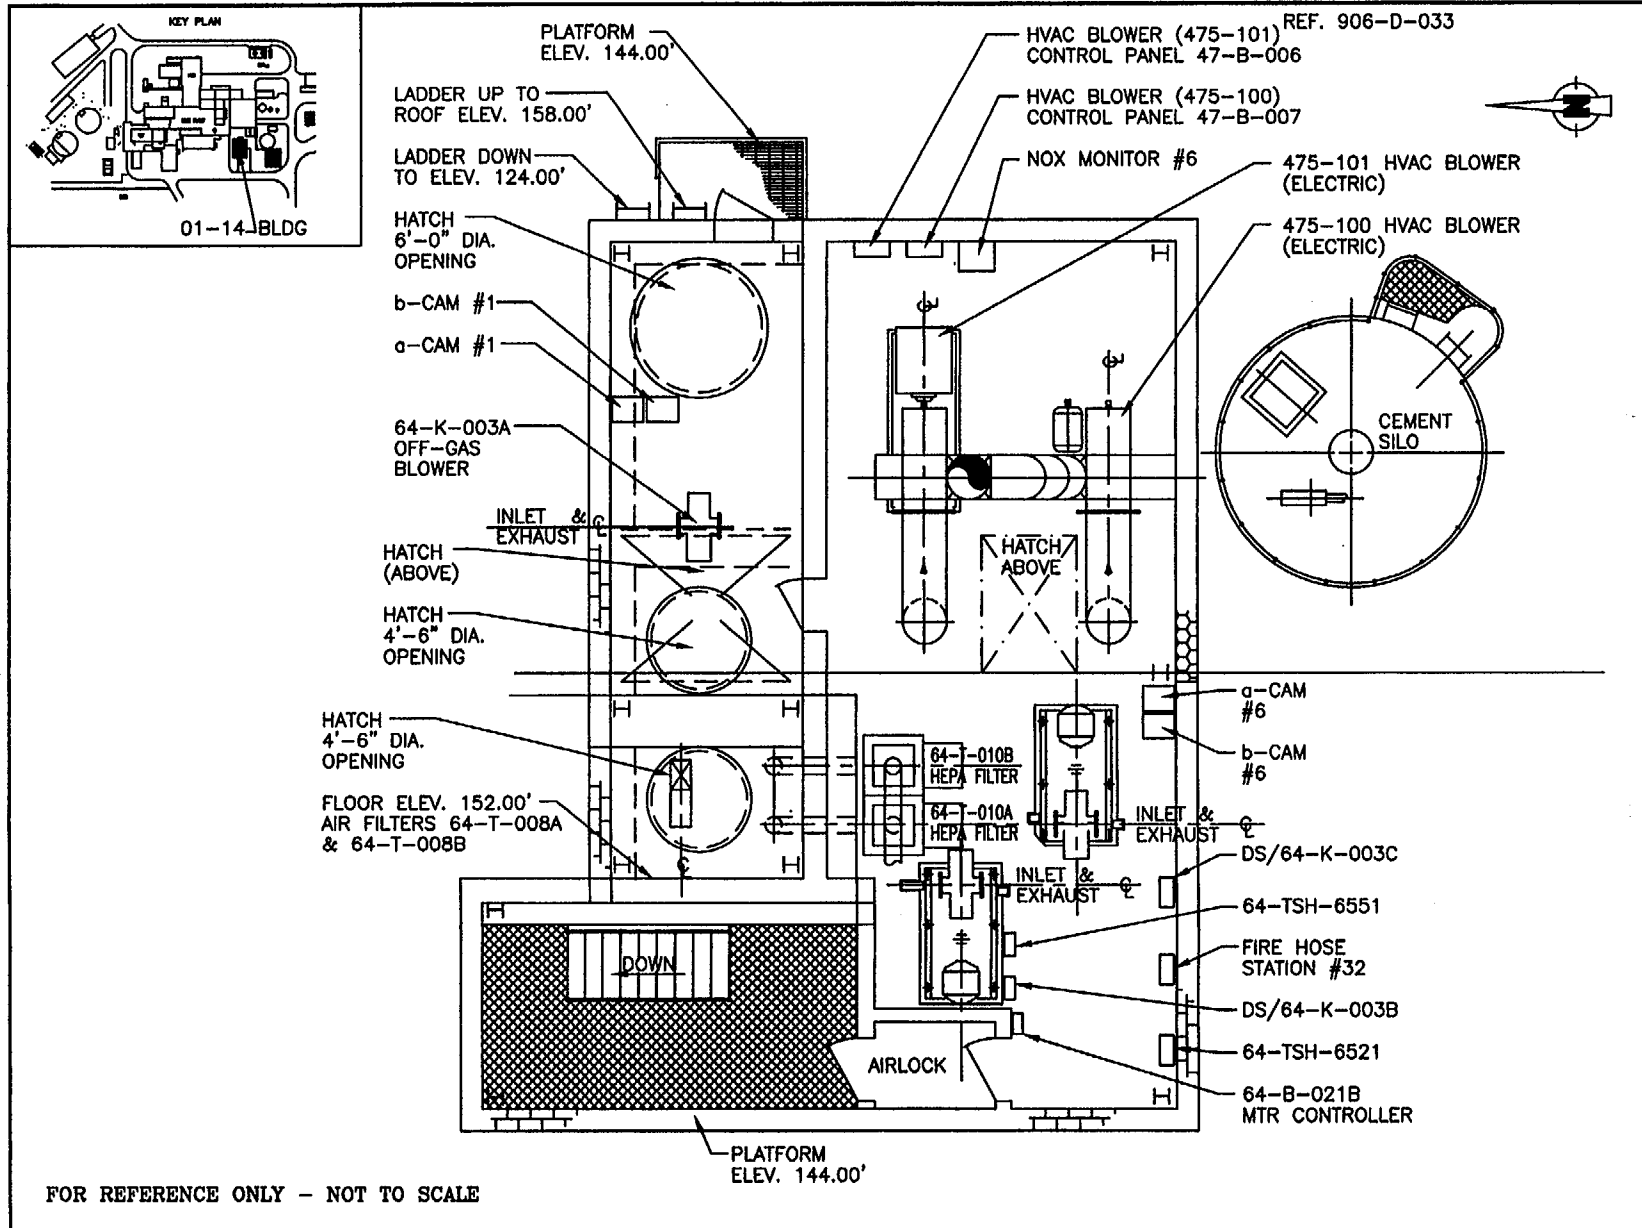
General Arrangement - 01/14 Building Plan Elevation 144.0'
